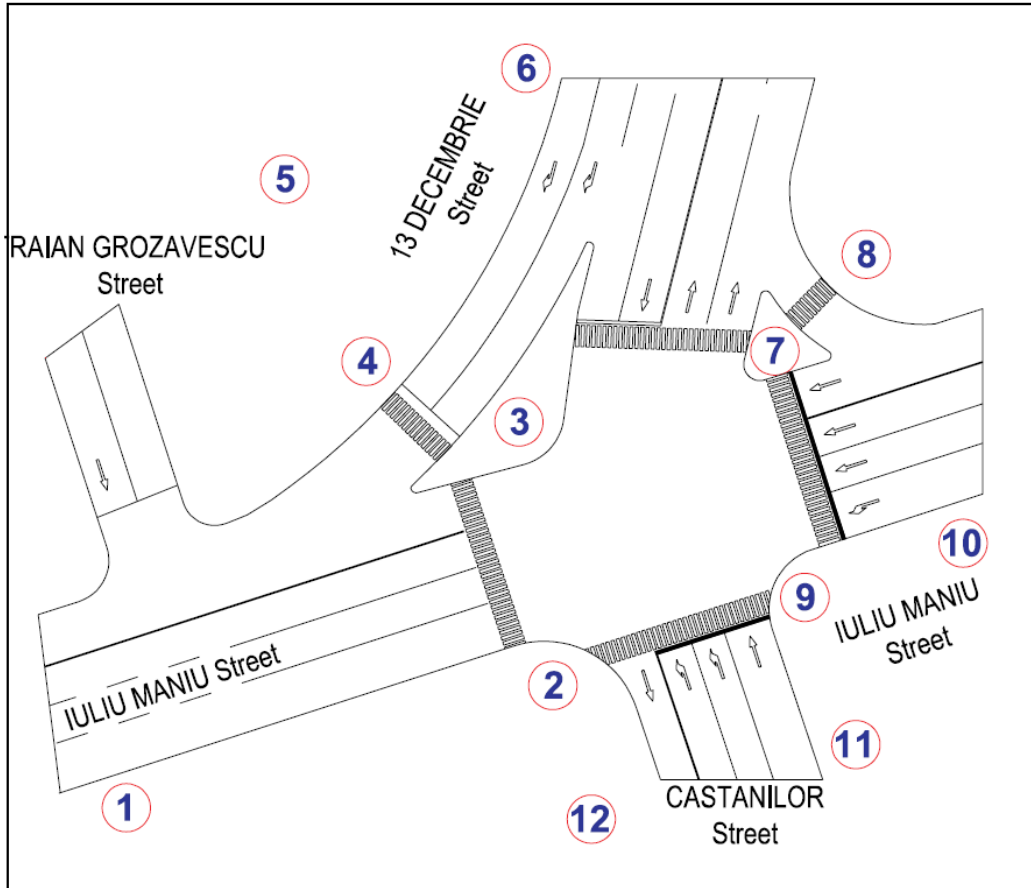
Measurement points intersection – Castanilor street + Iuliu Maniu street + 13 Decembrie street
